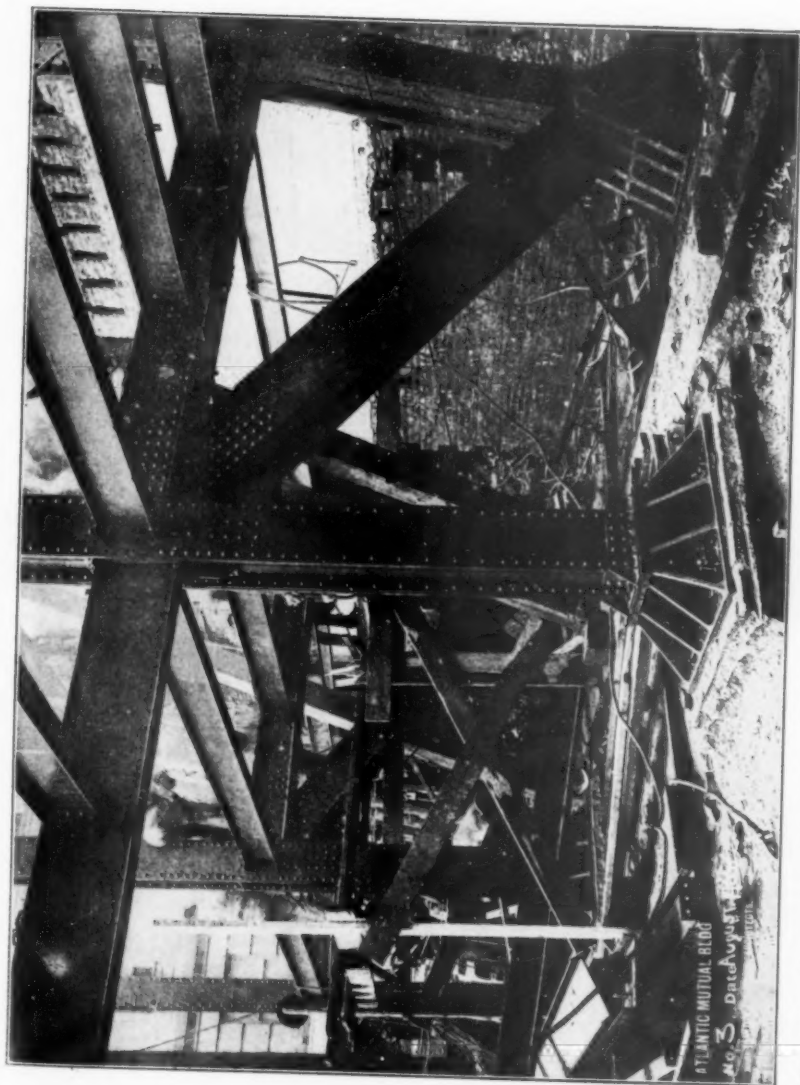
CANTILEVER SUPPORT FOR ONE COLUMN IN SIDE WALL OF THE ATLANTIC MUTUAL BUILDING.
